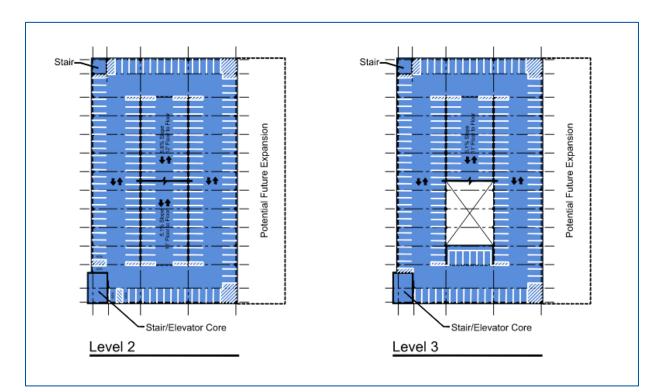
Preferred Concept - Level 2 and 3 Plan
